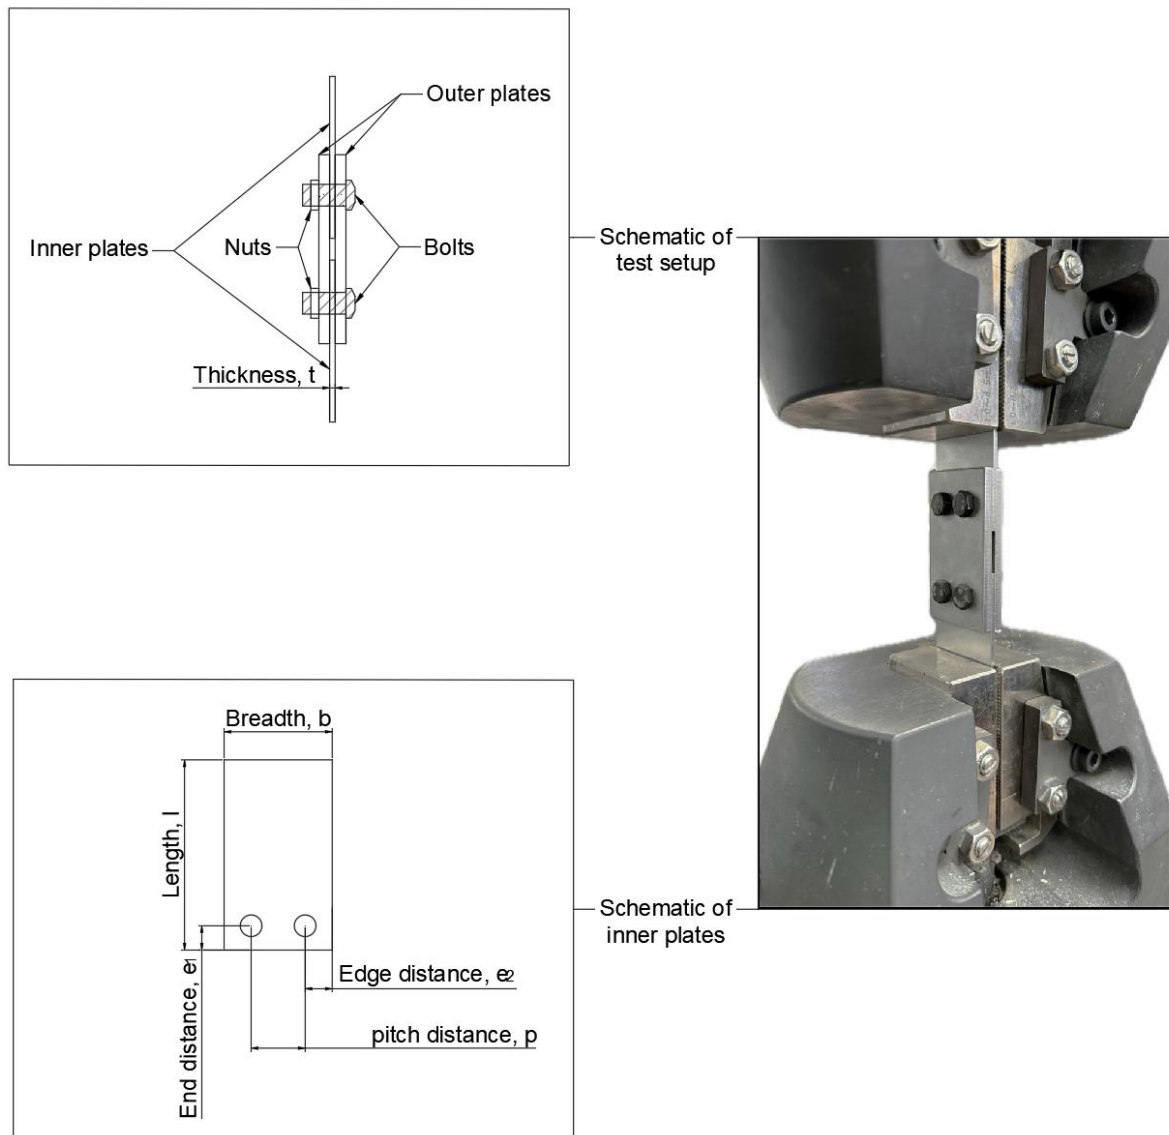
Test setup for double-lap shear bolted connections, including schematics illustrating the test components and geometrical design variables of the inner plate, specifically for the double-bolted configuration.
